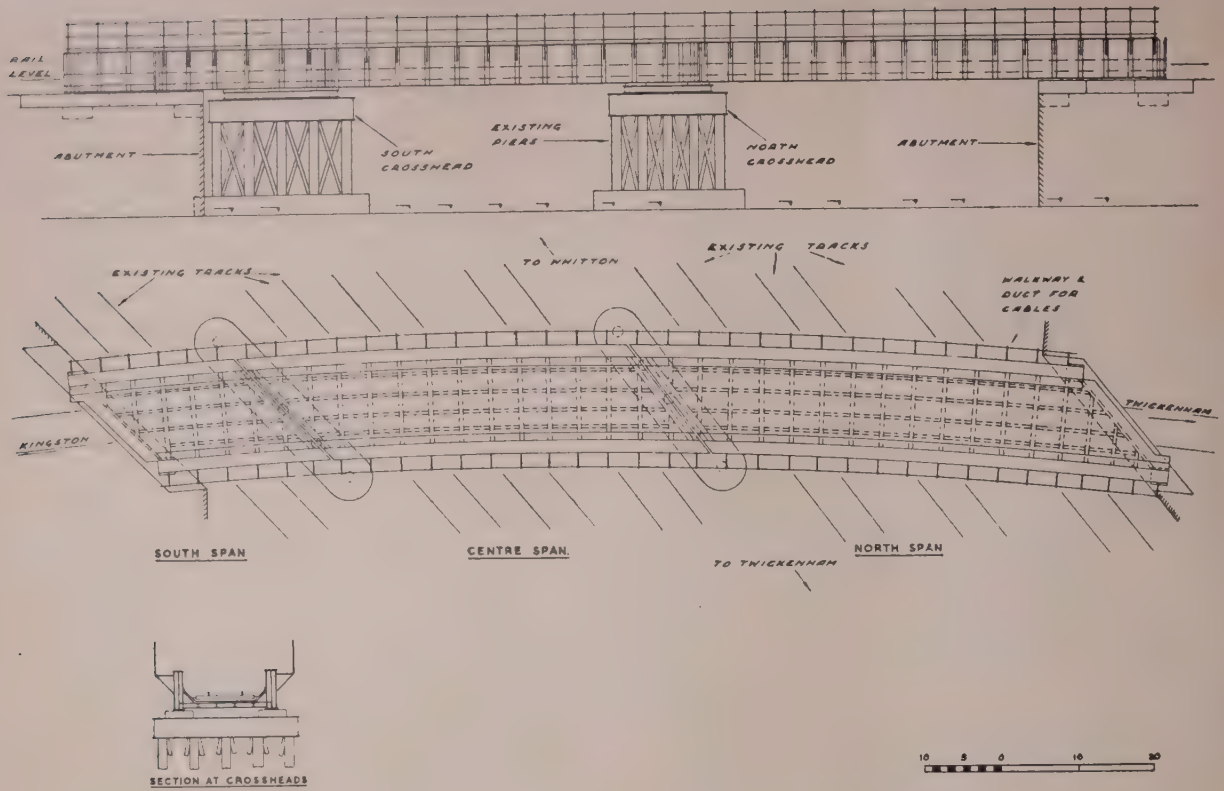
Twickenham Fly-over. Arrangement of new bridge
